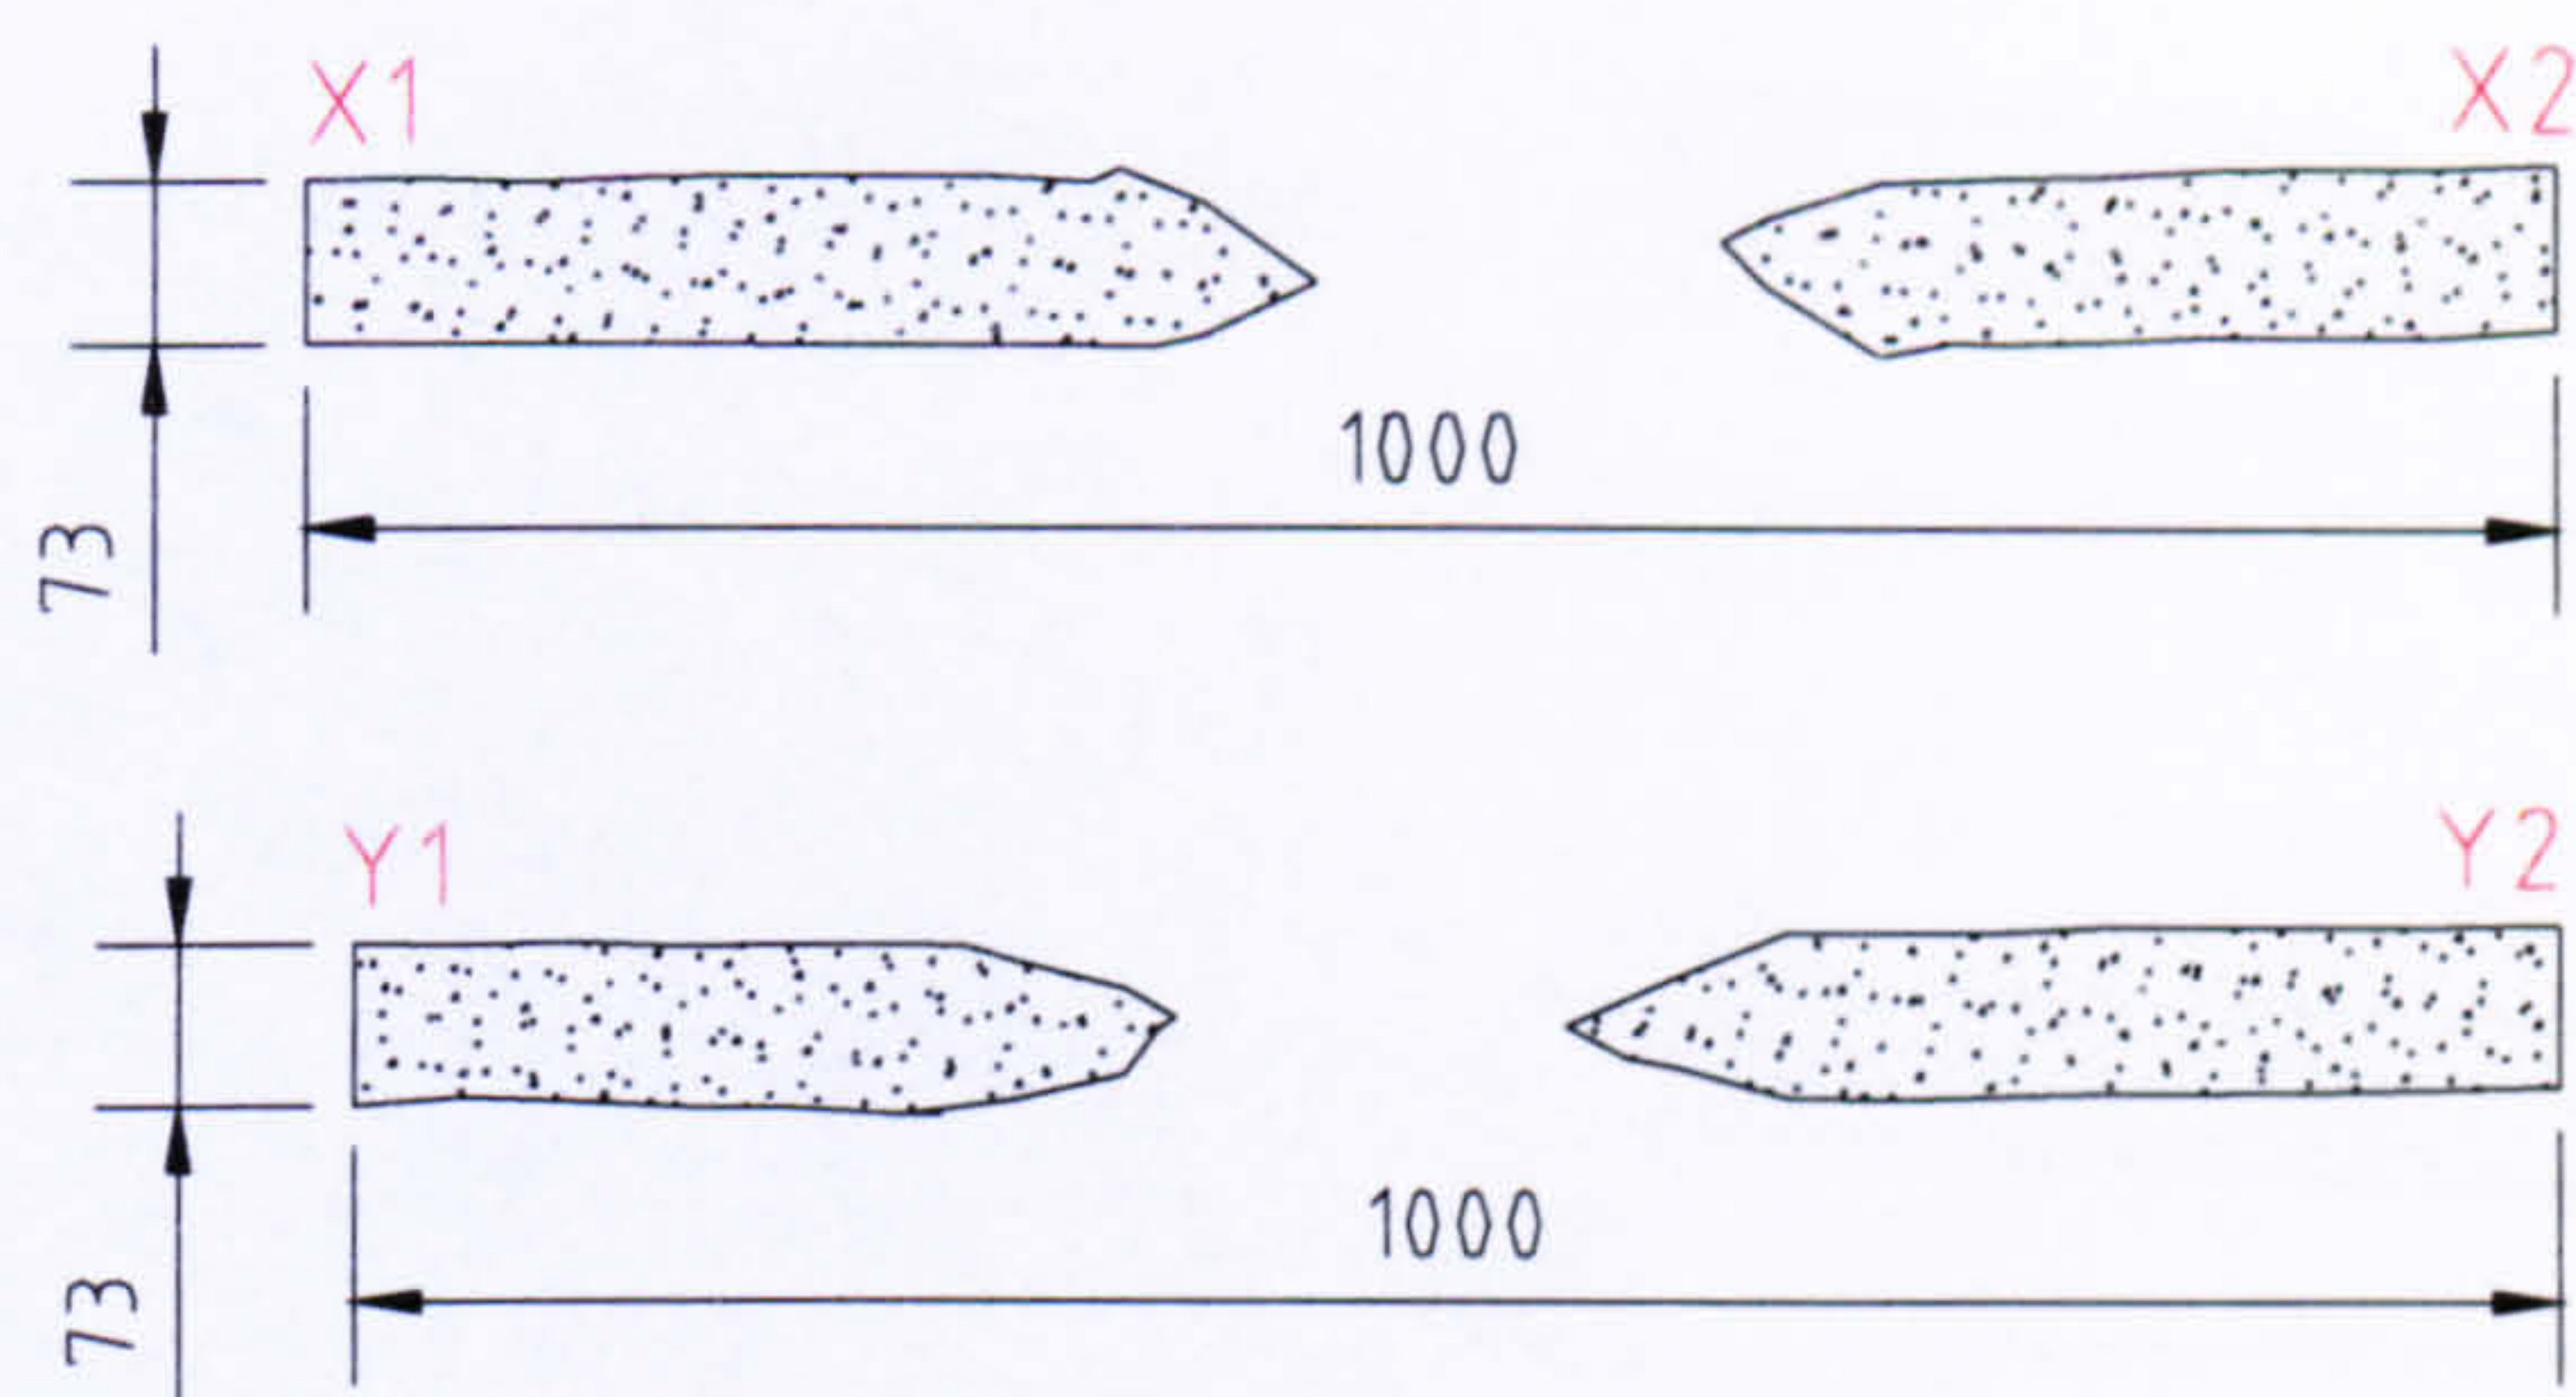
Cross-sectional elevation through X1-X2 and Y1-Y2 of secondary slab RCB73IT2
